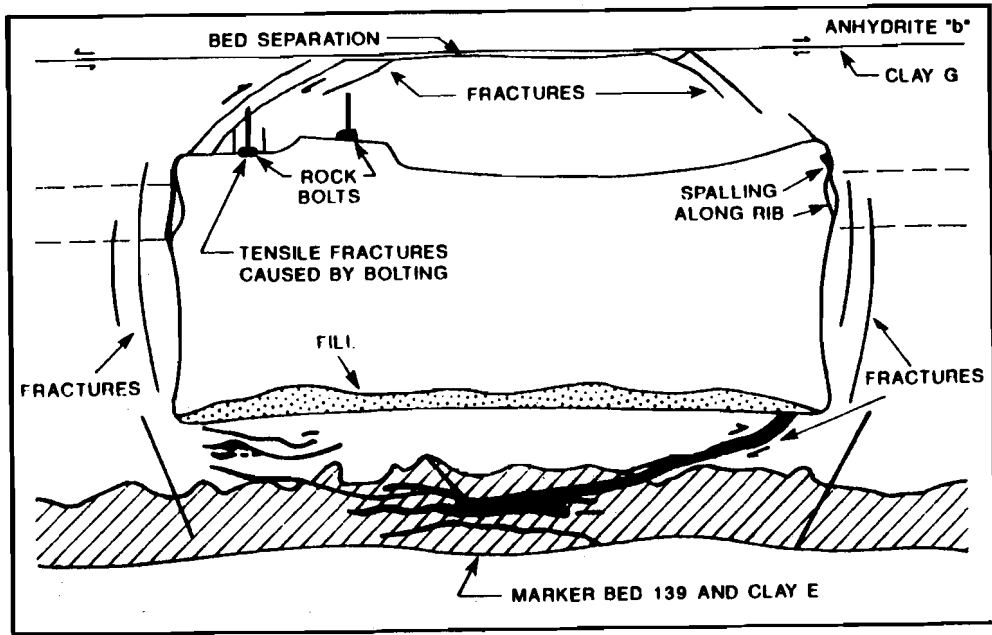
CROSS-SECTION OF FRACTURING AROUND A 4 m HIGH, 10 m WIDE WASTE STORAGE ROOM AT THE WIPP
